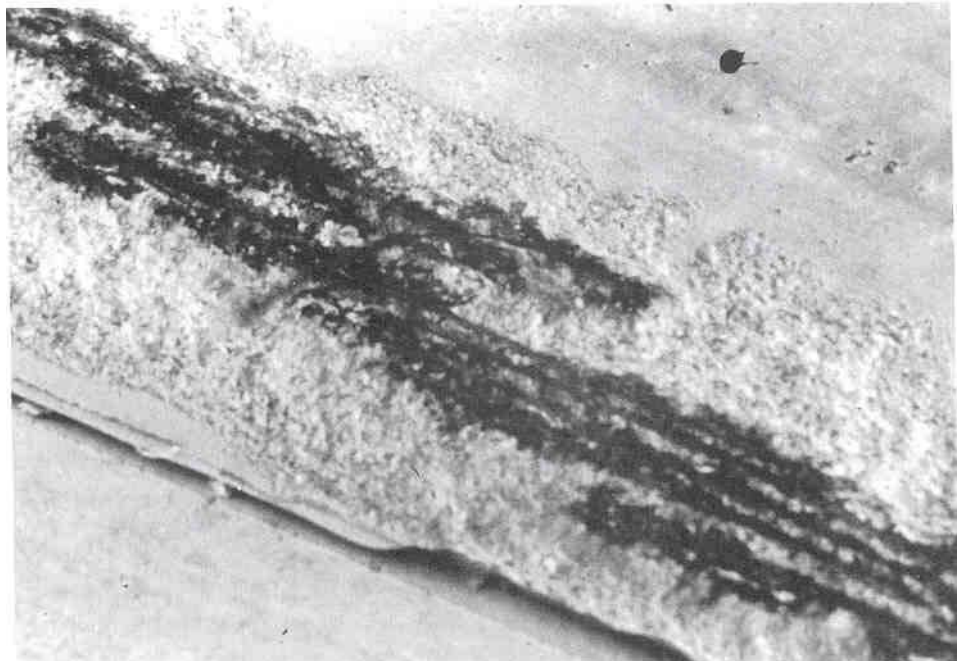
Exposed Strands in a Precast Slab Beam
